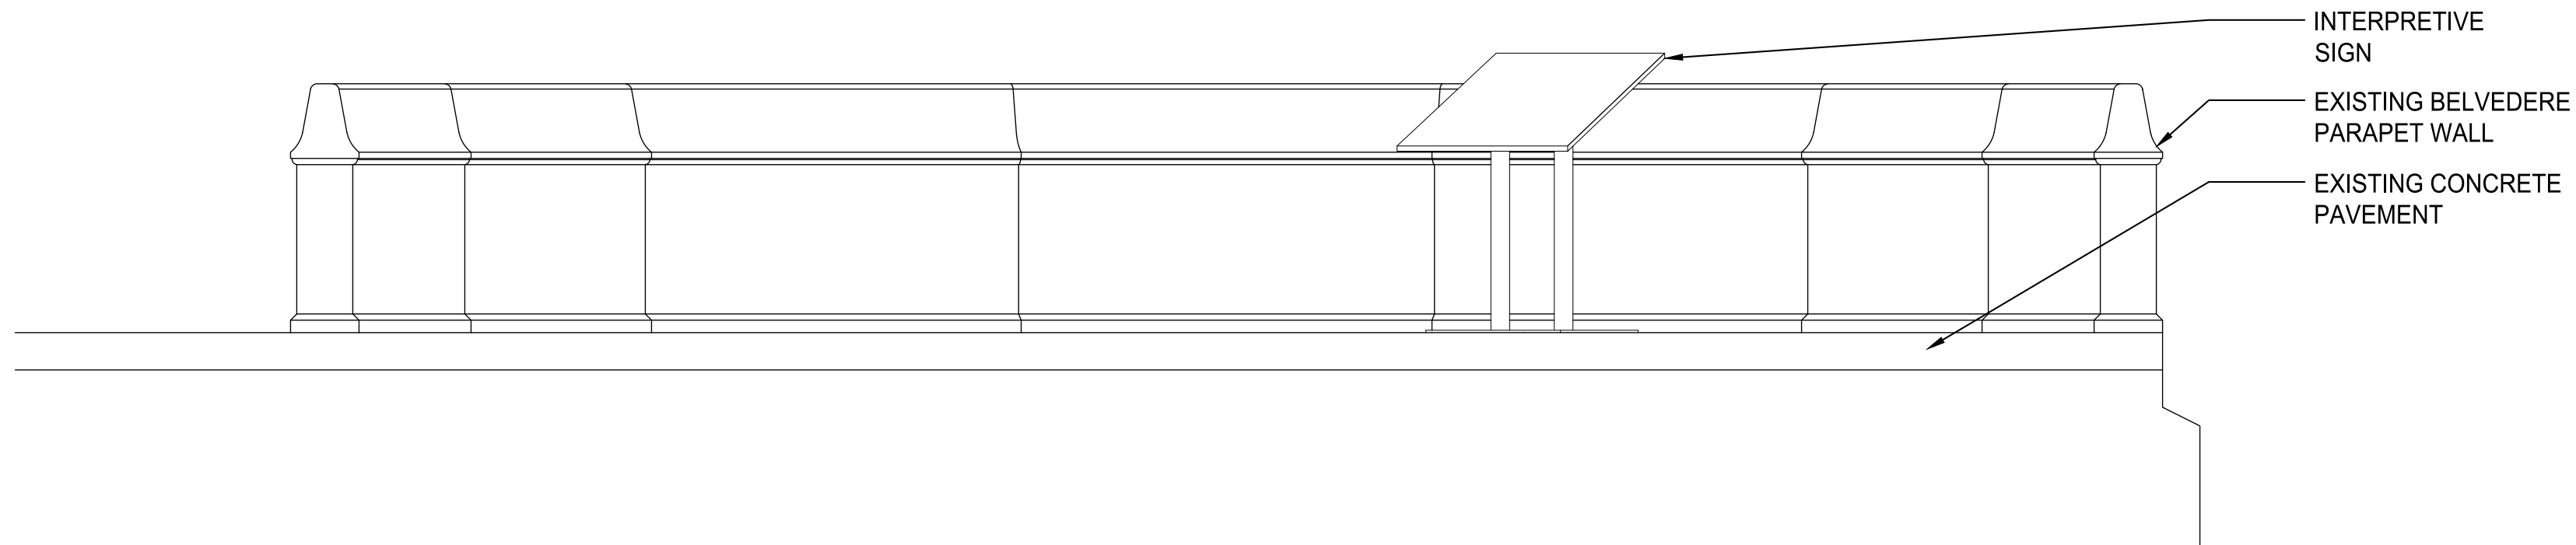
Sign Design Plan – Interpretive Sign Placement Plan & Section. Scaled drawing shows the sign installation layout in relation to the parapet wall, including heights and distance. *(Plans follow on next page)
